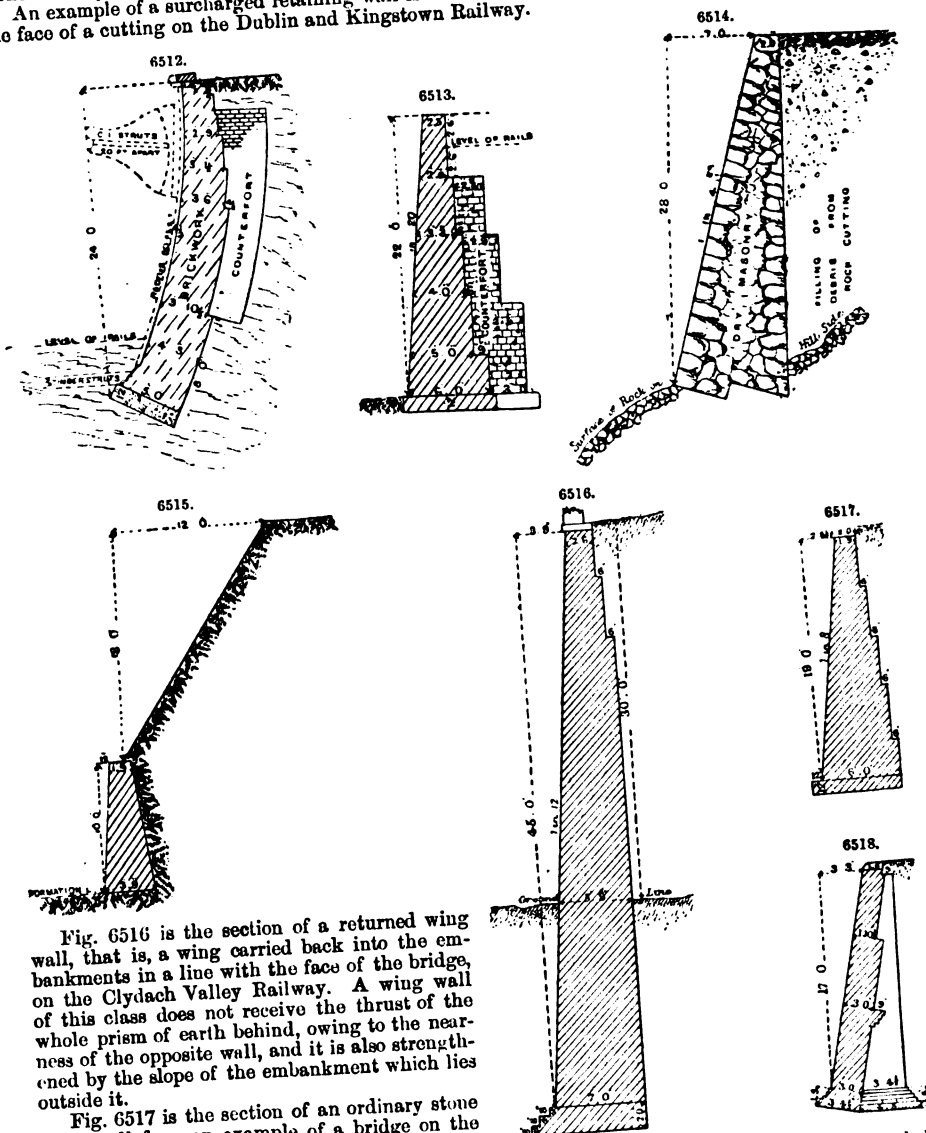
is the section of a returned wing wall, that is, a wing carried back into the embankments in a line with the face of the bridge, on the Clydach Valley Railway. A wing wall of this class does not receive the thrust of the whole prism of earth behind, owing to the nearness of the opposite wall, and it is also strengthened by the slope of the embankment which lies outside it.
